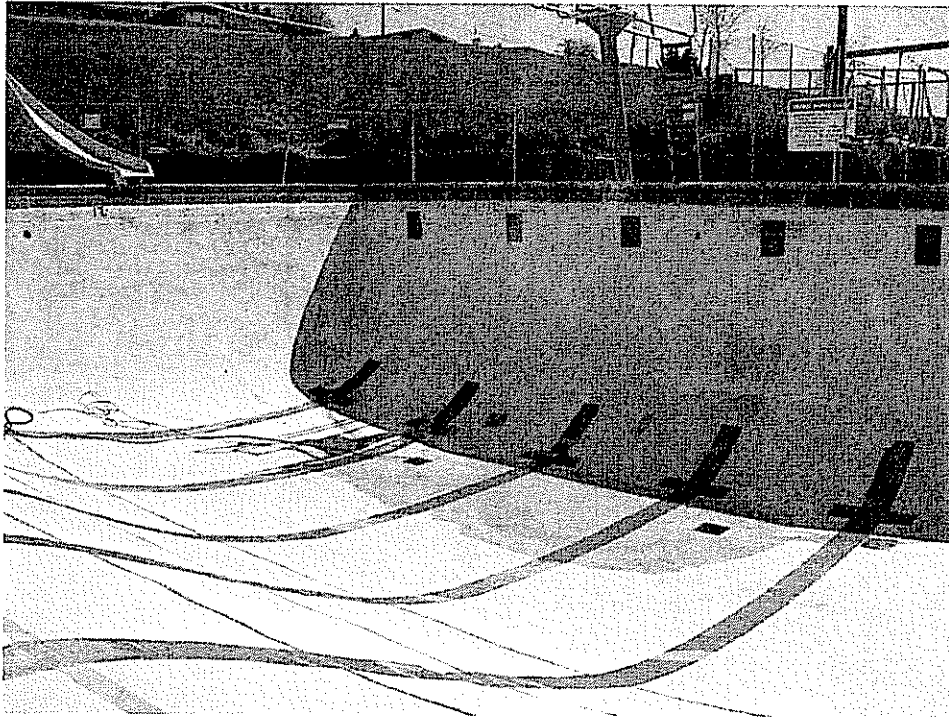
& 2: Wading Pool wall deterioration and tile damage
